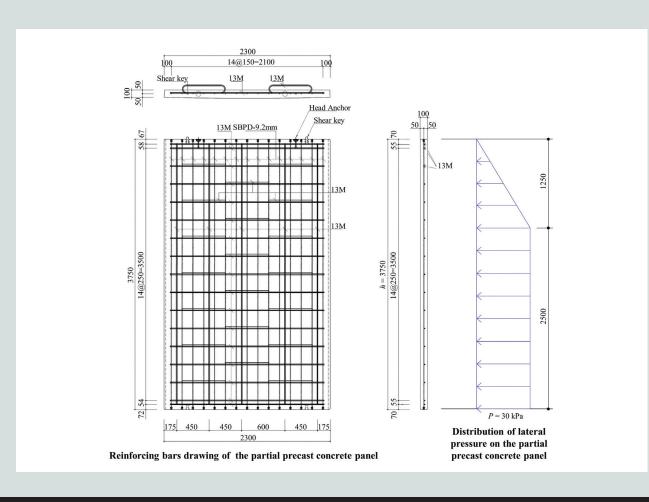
Design drawing of partial-thickness precast concrete panel. Note: All dimensions are in millimeters. SBPD = steel bars for prestressed concrete. 13M = no. 4; 1 mm = 0.0394 in; 1 kPa = 0.145 psi.
